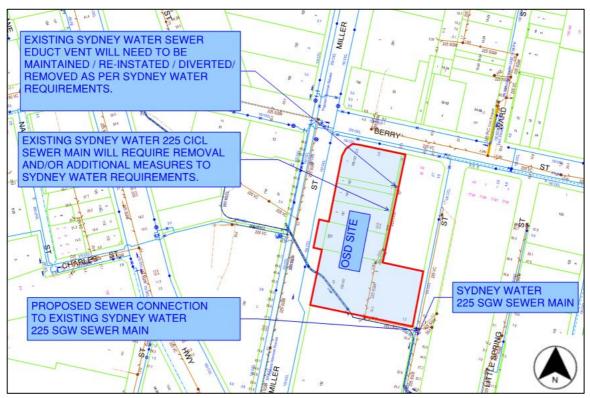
Existing Sydney Water sewer assets and proposed OSD sewer connection Source: DBYD, 2017
